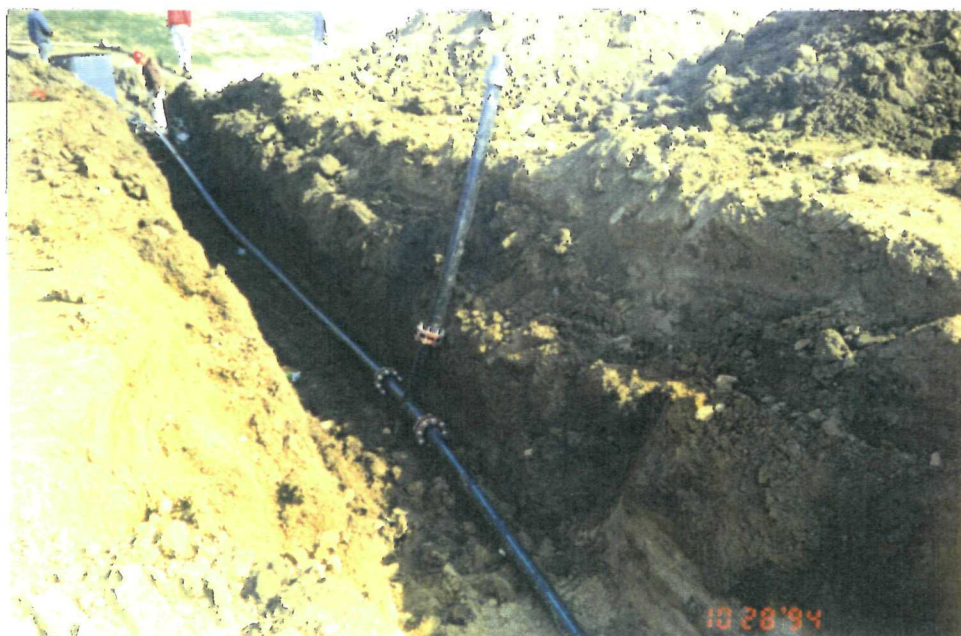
Leak detection view port installed on untreated groundwater piping outside cut-off wall.
